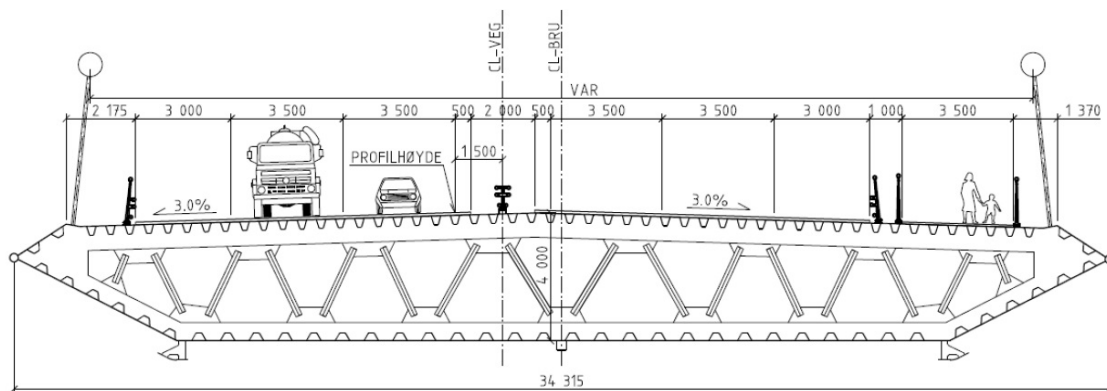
The steel box girder as presented by Norconsult in 2015 [6]
